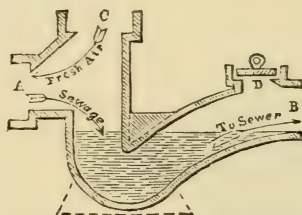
A. Socket for house drain. B. Connection with outfall drain. C. Socket for fresh air inlet pipe. D. Cap for clearing purposes.
